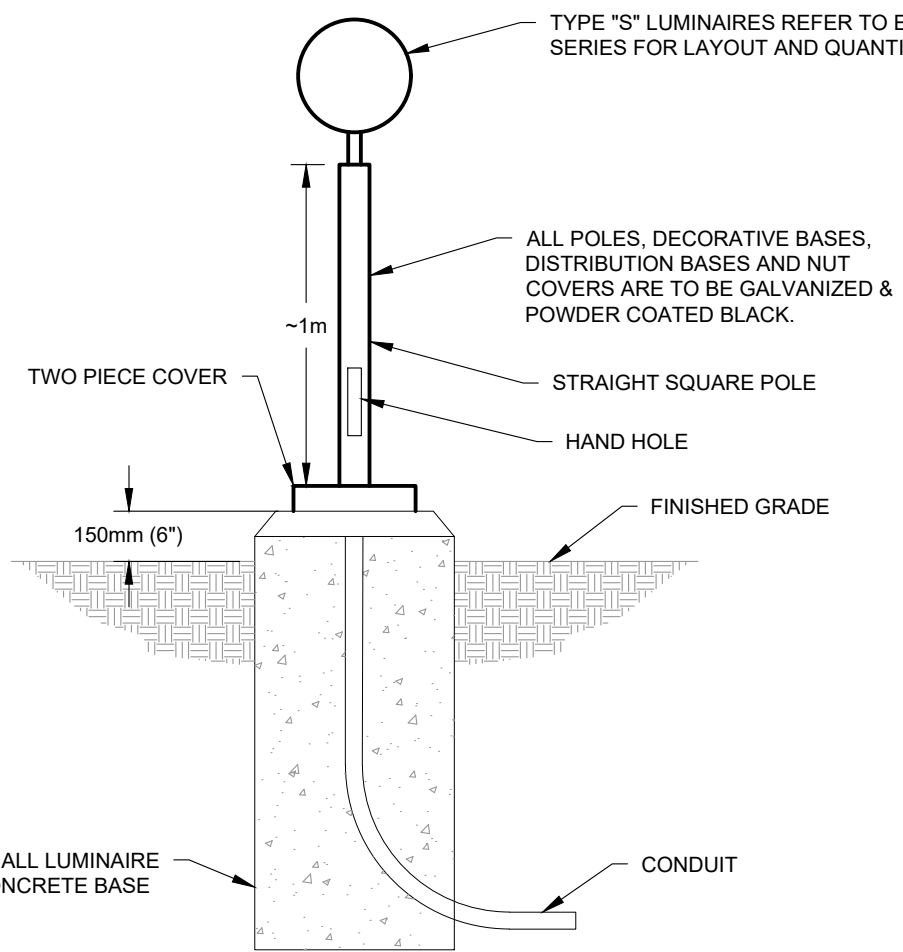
POLE LUMINAIRE FIXTURE TYPE "S + T" MOUNTING DETAIL
